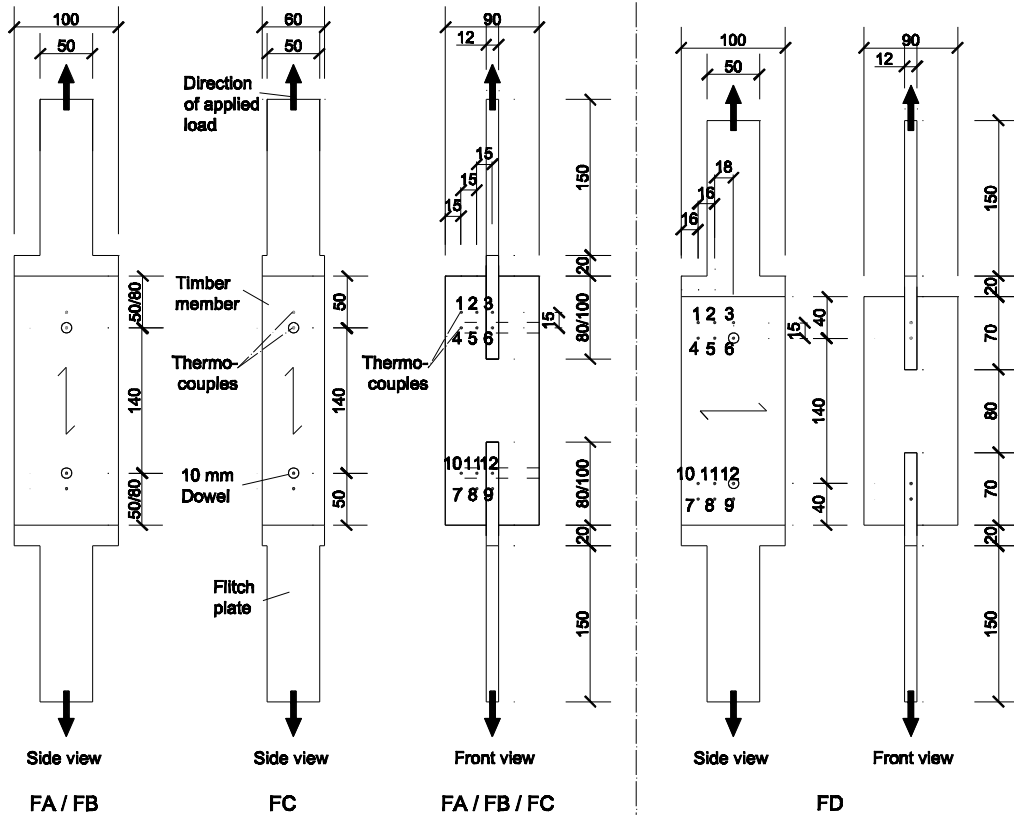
Dimensions of the tested specimens and locations of thermocouples (dimensions in mm)
